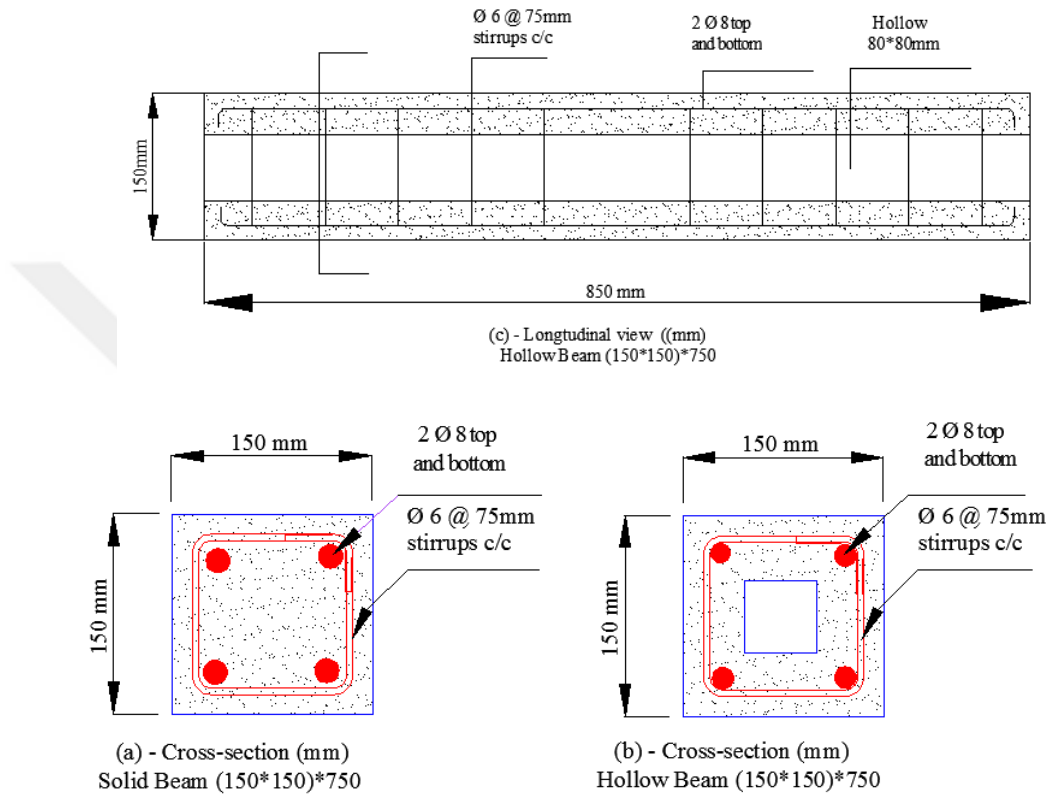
Reinforced concrete beam with solid and hollow section.
